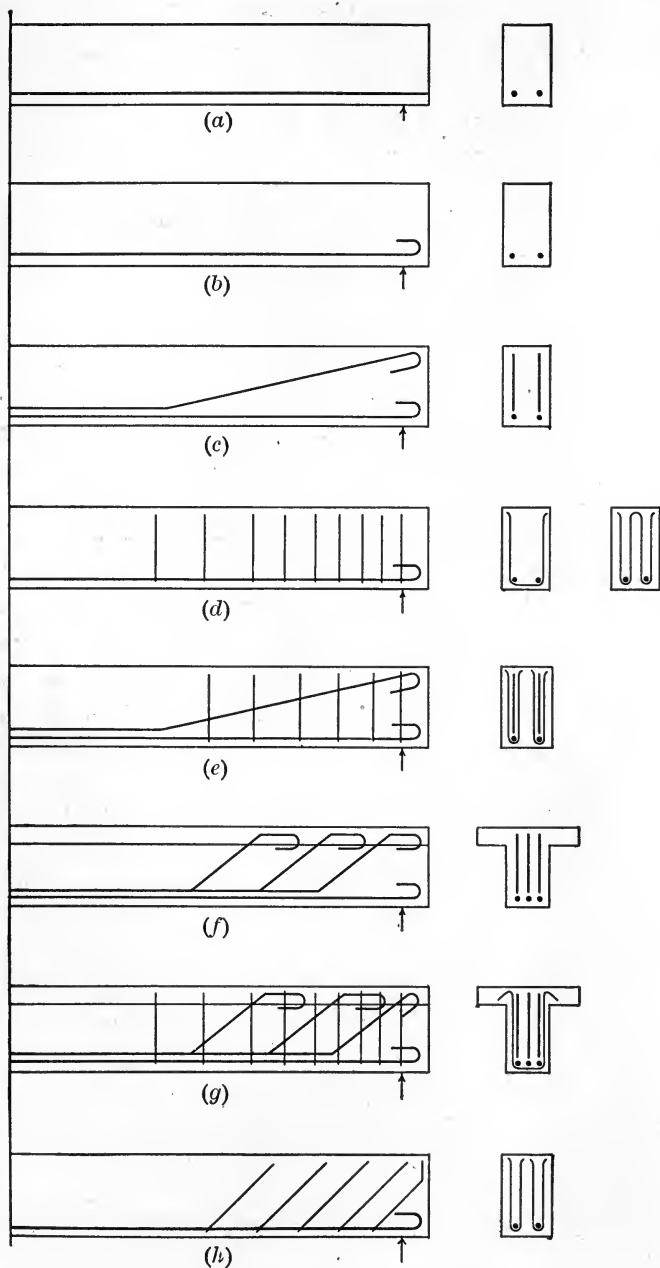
General Methods of Arranging Beam Reinforcement.
